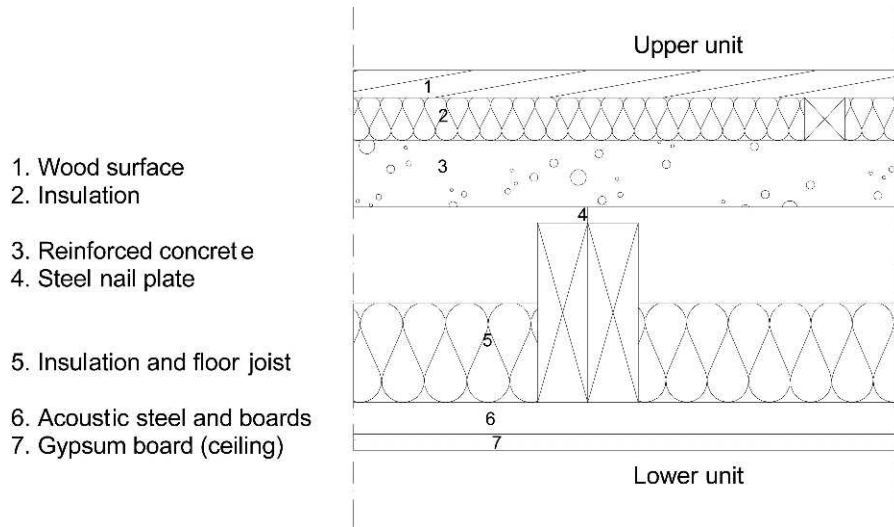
An example of an intermediate floor construction in a wood-framed apartment building at the beginning of the 21st century. The load-bearing layer in the middle consists of insulation and floor joists (4 and 5), the overlaying sound insulation layer consists of blinding and supporting rails and surface layers (1 through 3), and the underlying layer (ceiling) consists of supporting rail, steel bone, and board layers (6 and 7). (Picture based on Karjalainen 2002.)
